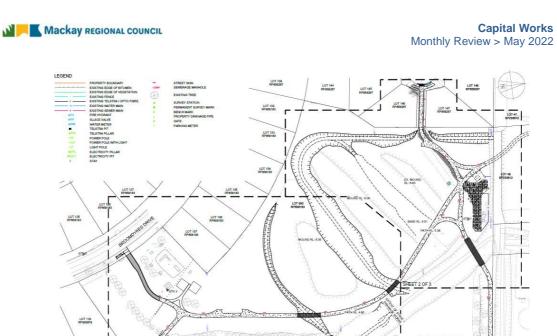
General Arrangement Plan for Stage 1, Phase 1 works
